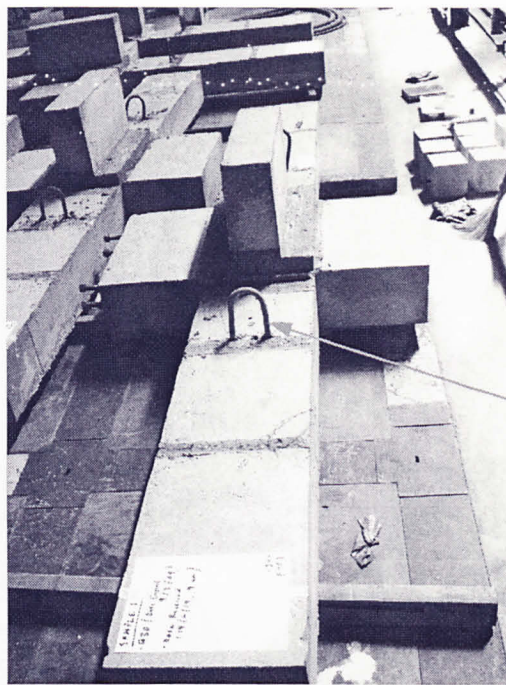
Plate girders (1255x200x100mm and 975x200x100mm)
